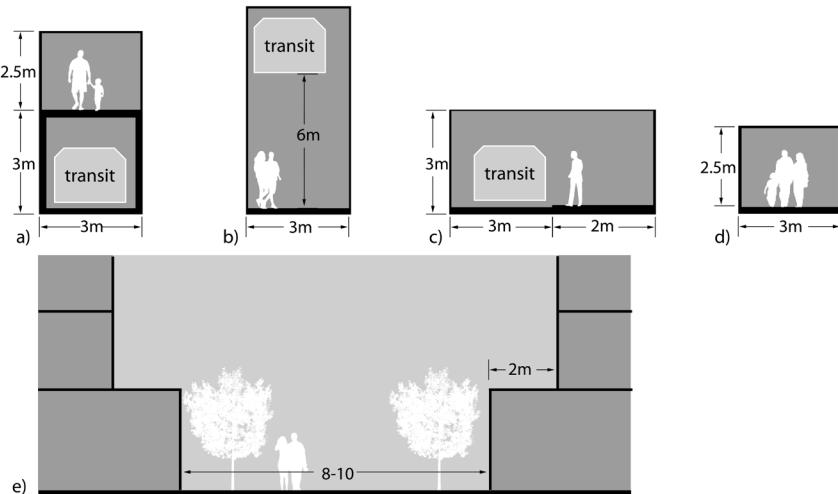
A - Example transit setbacks and dimensions commonly used: a) transit below pedestrian street [7], b) transit elevated above pedestrian thoroughfare[7], c) transit adjacent to pedestrian walk [7], d) typical comfortable walk width [7], e) typical comfortable pedestrian width between structures
